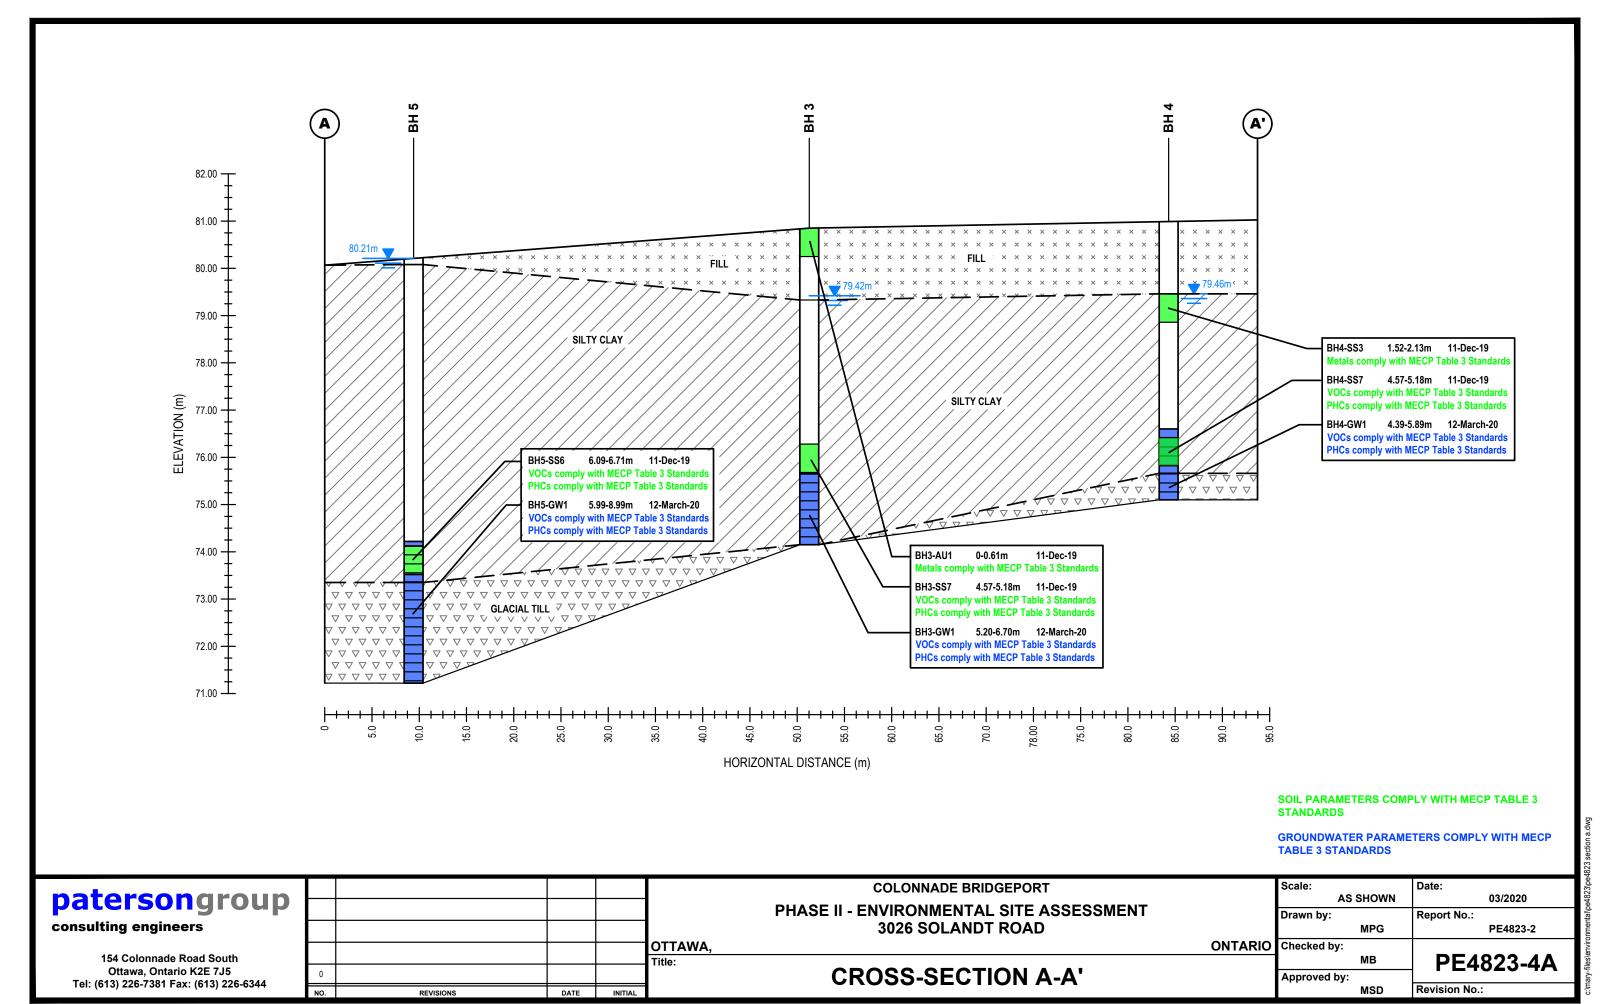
A – Cross-Section A-A' - Analytical Testing Plan
